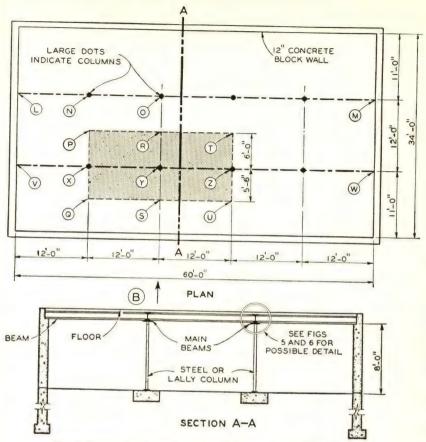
Columns in a Dairy Barn and the Floor Area They Support
